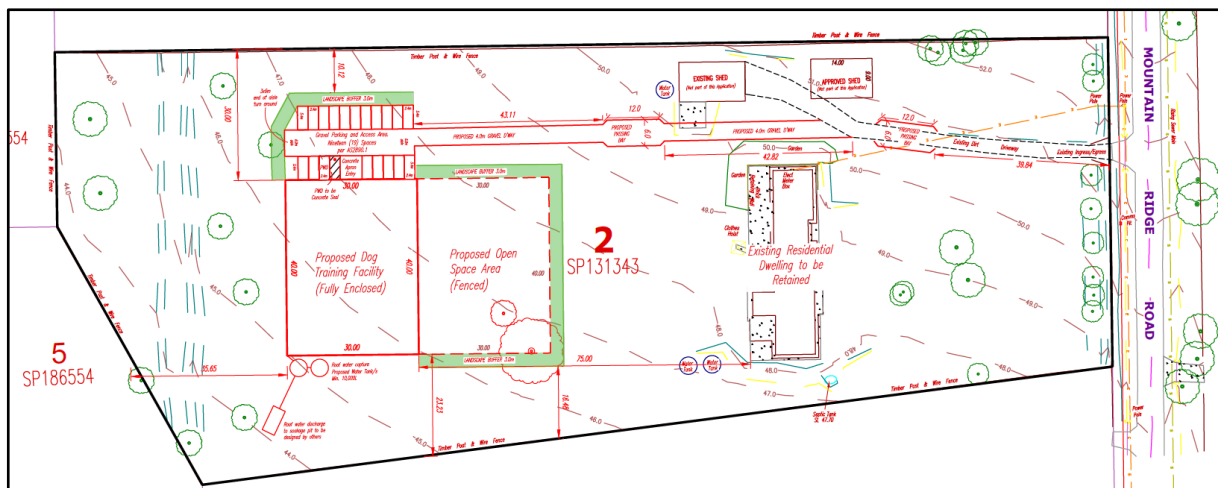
Proposal Plan - Baird & Hayes – MCU Site Plan
